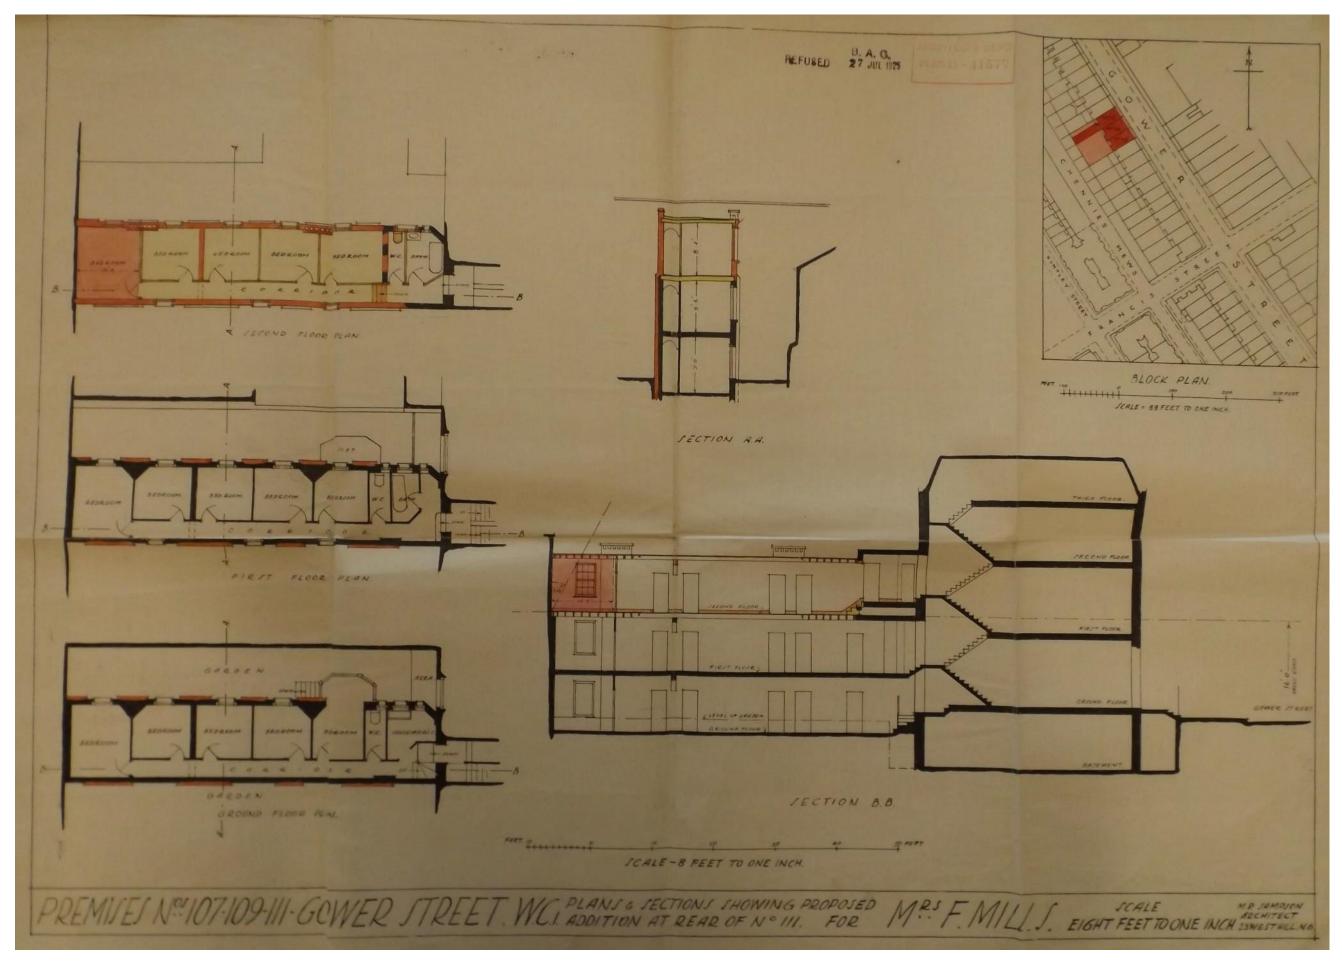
1925 Elevations and Section of second floor addition to 19th century wing of No.111 Gower Street
